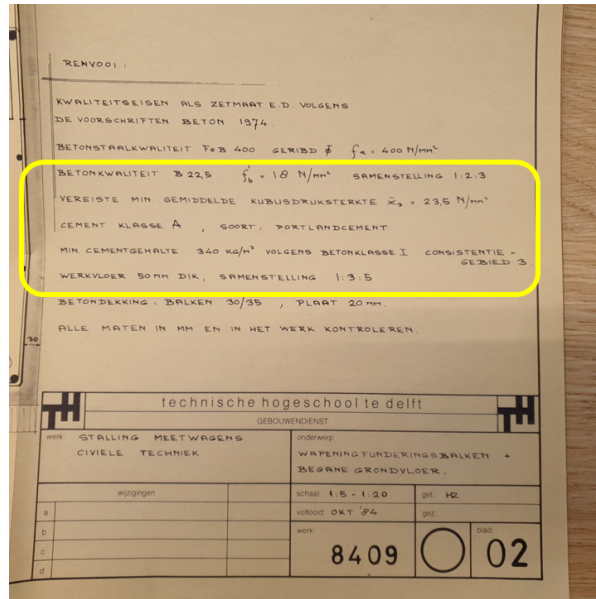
Cement type specification foundation beams and ground floor, CiTG (credits to CREFM)
